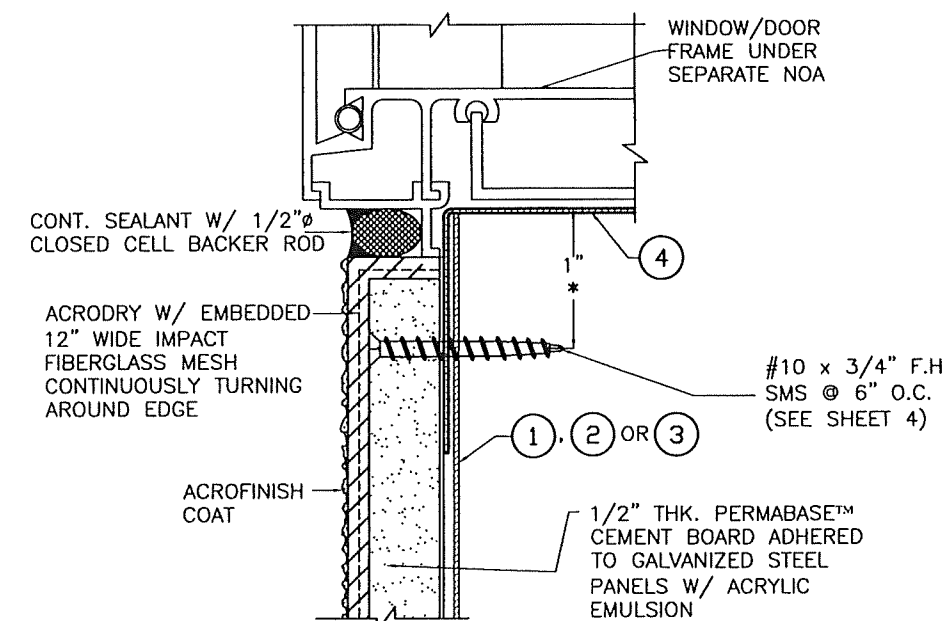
DETAIL C: WINDOW JAMB CONNECTION TO PANEL
